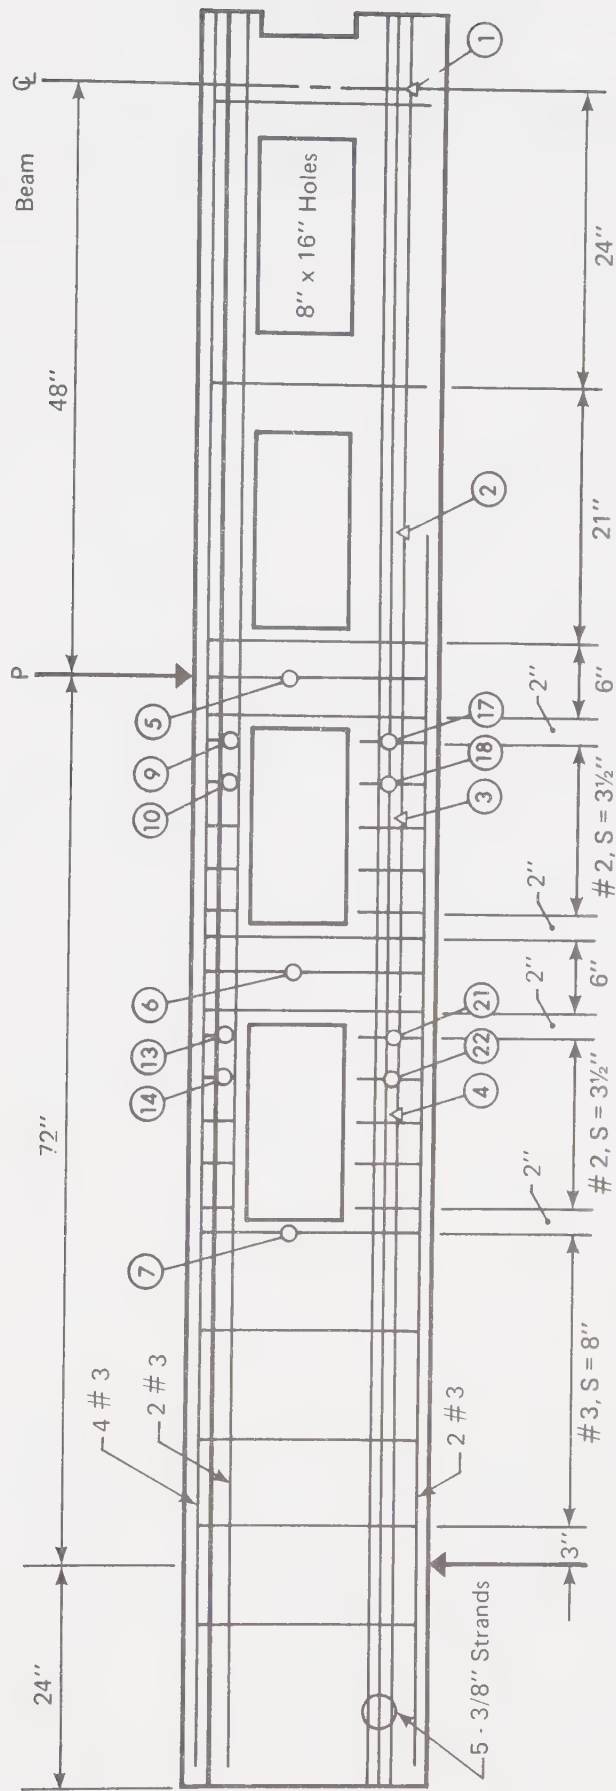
Reinforcement Details and Strain Gage Locations for Beam 3-16-6
